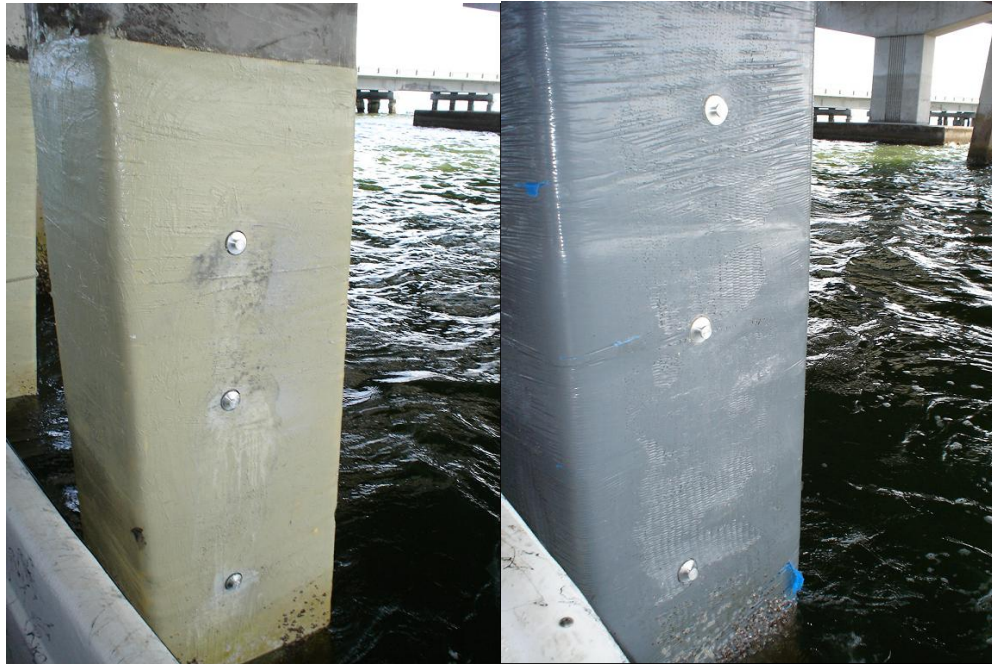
Installed Dollies on Pile2 (L) and Pile3(R)
